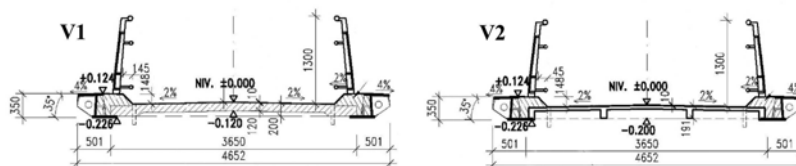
Variants V1 and V2 of the footbridge deck (Kalny, 2018).
